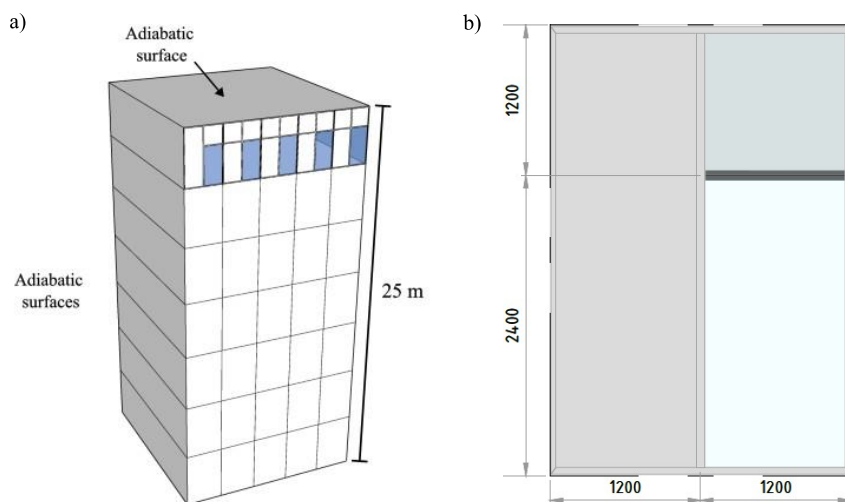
Generic office building (a) and hybrid timber and aluminium façade unitized block (b)
